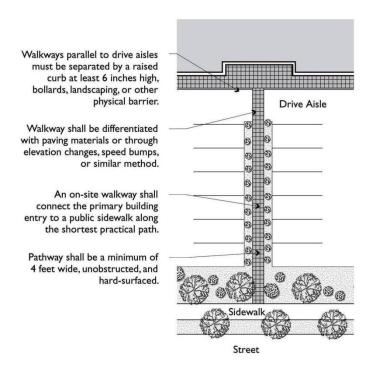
A: PEDESTRIAN ACCESS THROUGH PARKING AREA
